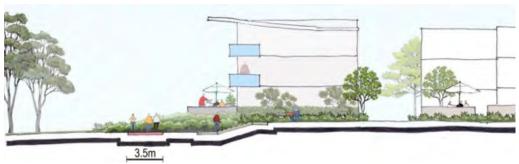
SECTION THROUGH VILLA INTERFACE TO PUBLIC OPEN SPACE AND TYPICAL PARKLAND LANDSCAPE
